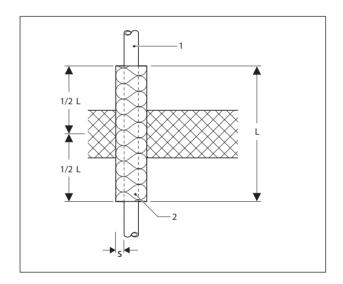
Fire protection, Geberit Mepla Ø 16 - 75mm: Ceiling penetration
